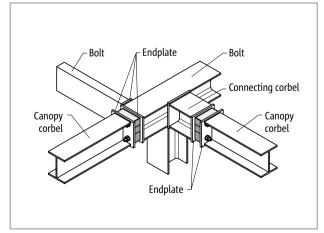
Schöck Isokorb® T Type S for outer corner detail
